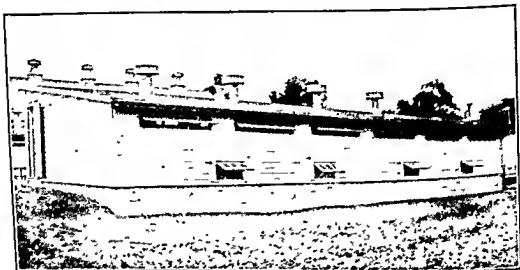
Providing summer ventilation by means of hinged ventilators and windows at the rear of a laying house (*Pa. State Coll. Ext. Service.*)
